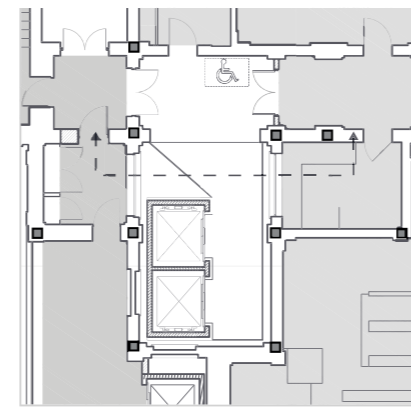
Proposed column layout at SE lightwell - Lo1
